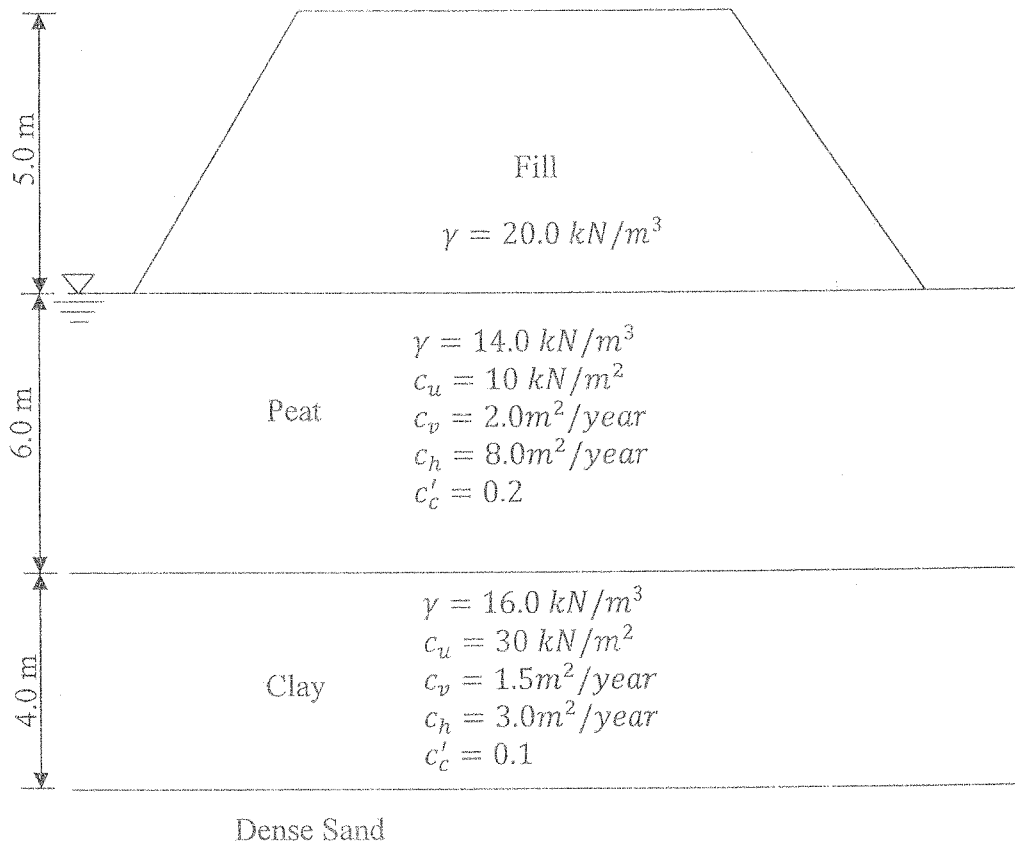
Cross section of the embankment with sub surface soil profile
